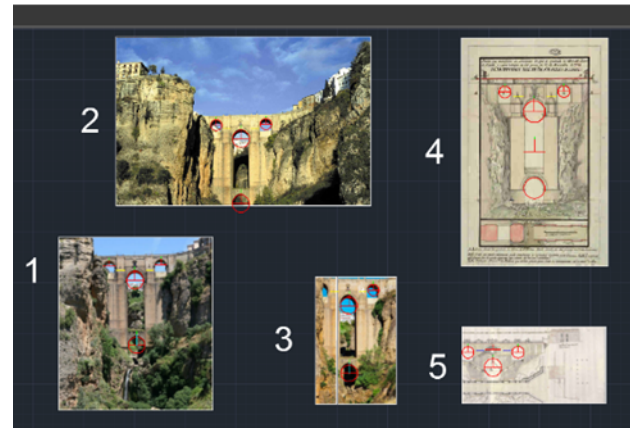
Gallery crossing one of the piers of the New Bridge (source: authors)
